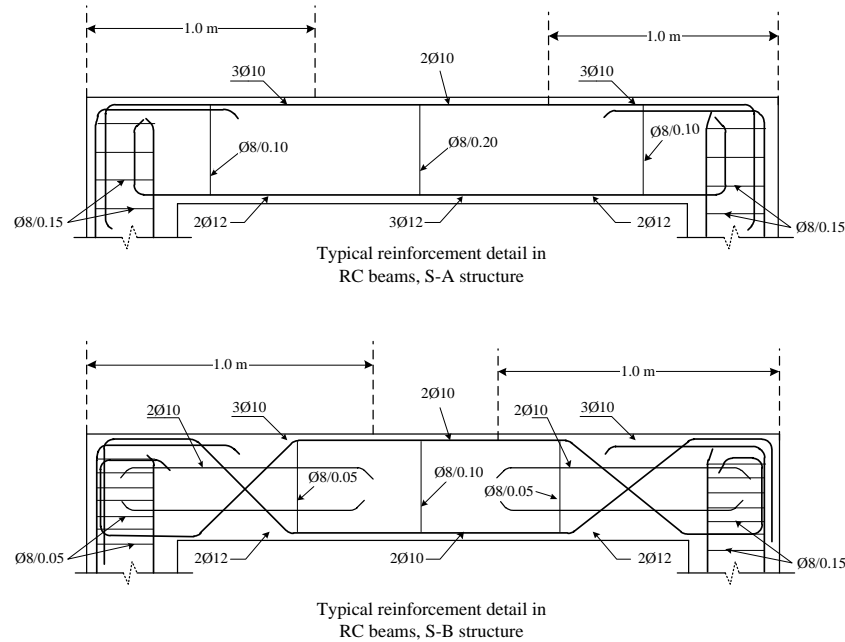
The longitudinal reinforcement details for the typical RC beam members in S-A and S-B structures [14].
